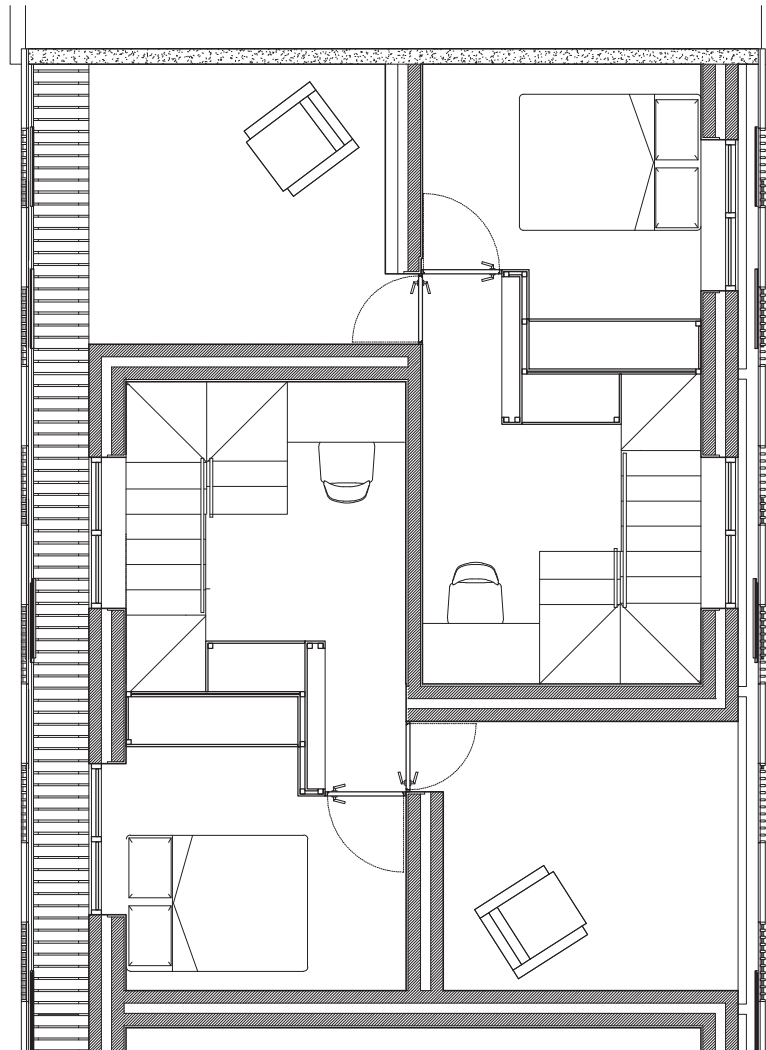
Plan of the apartment's E second floor. The dashed part correspond to the other apartment that has the rest of the apartment on the block's third floor..
